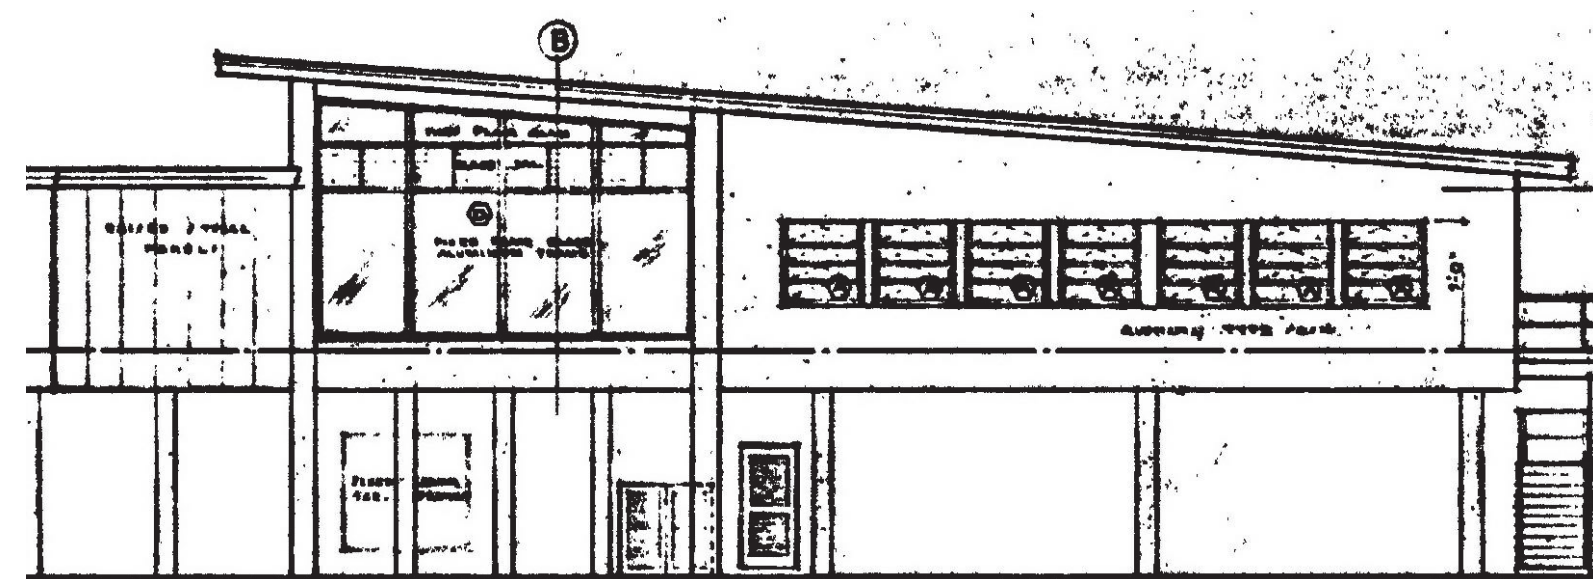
IMAGE W: ORIGINAL BLUEPRINT EAST ELEVATION (KECK, JR. ARCHITECT 1956)
